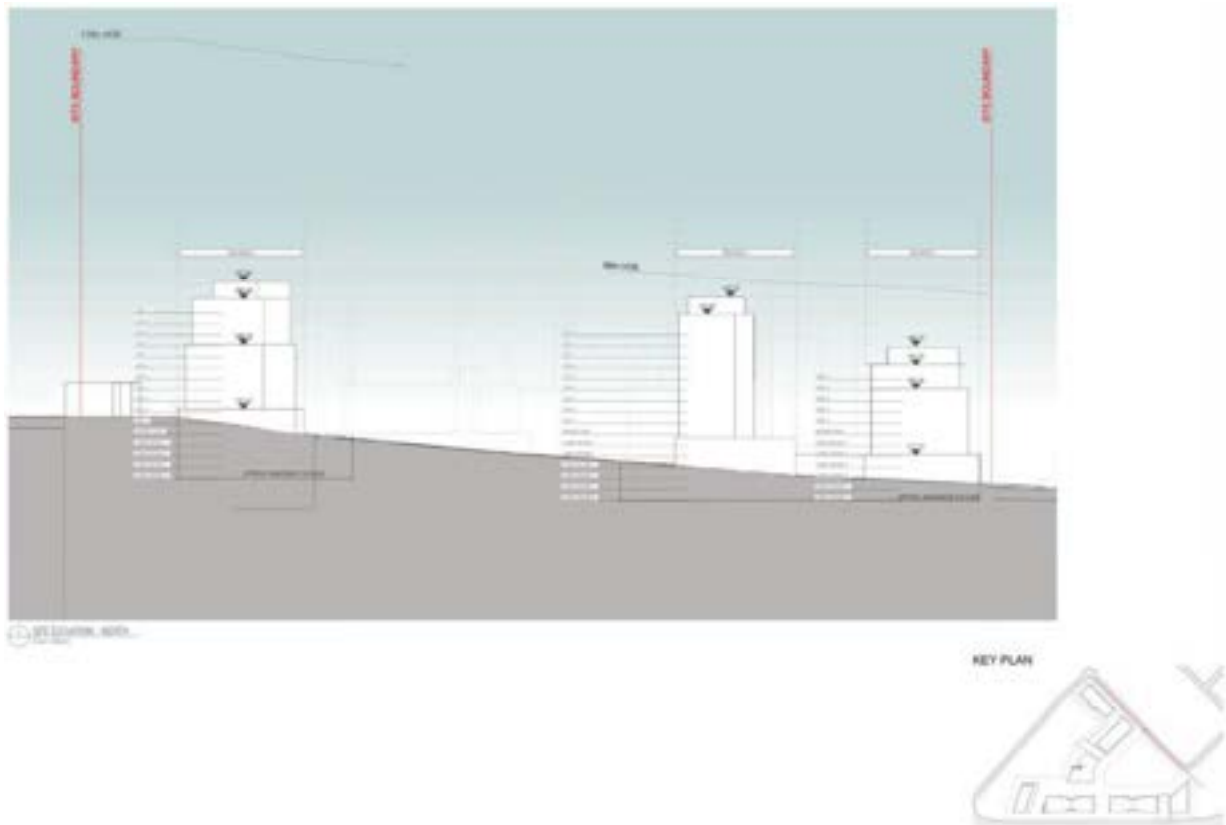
PP01.15 Site Envelope Elevations – North. *Source:* Fender Katsalidis 2023.
